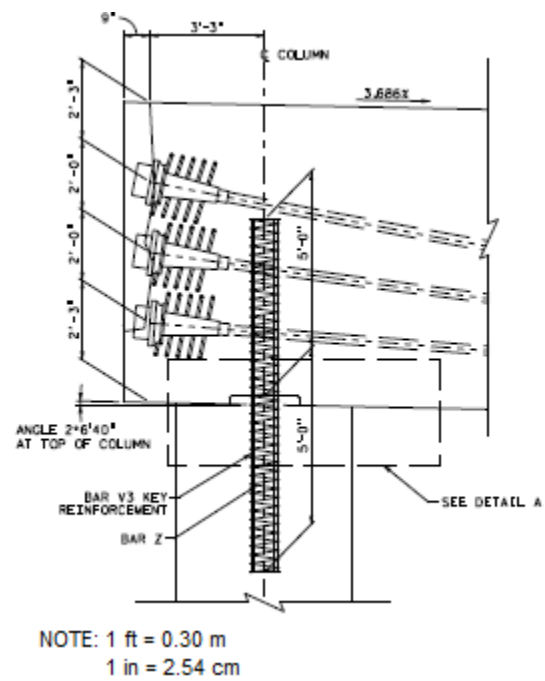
Post-Tensioned Cap. End and Support Detail
